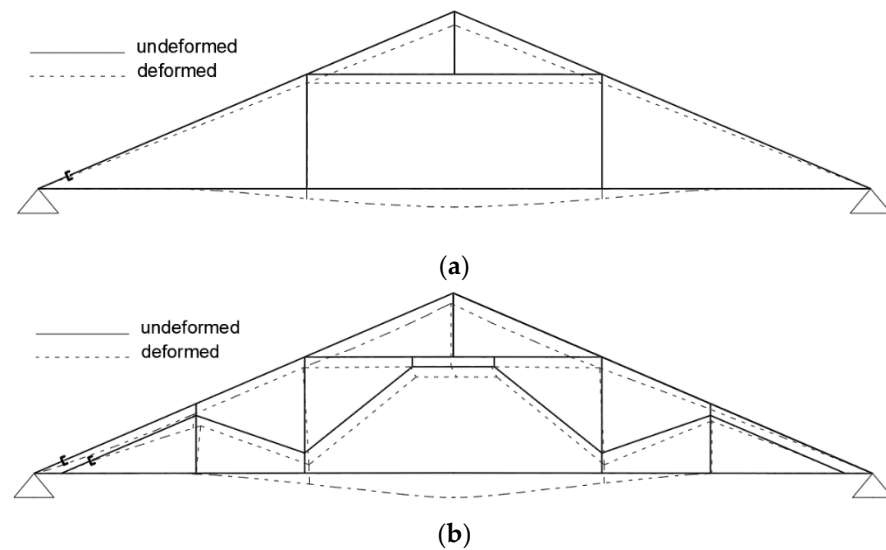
Deformed configuration of the roof truss: (a) 1—original; (b) 2—post intervention.
